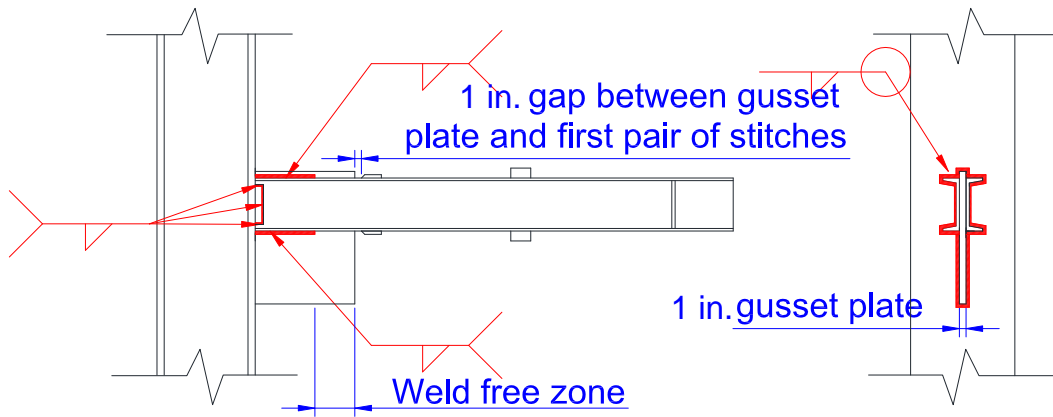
Welding Scheme at the Connection of Double Channel Component Test
